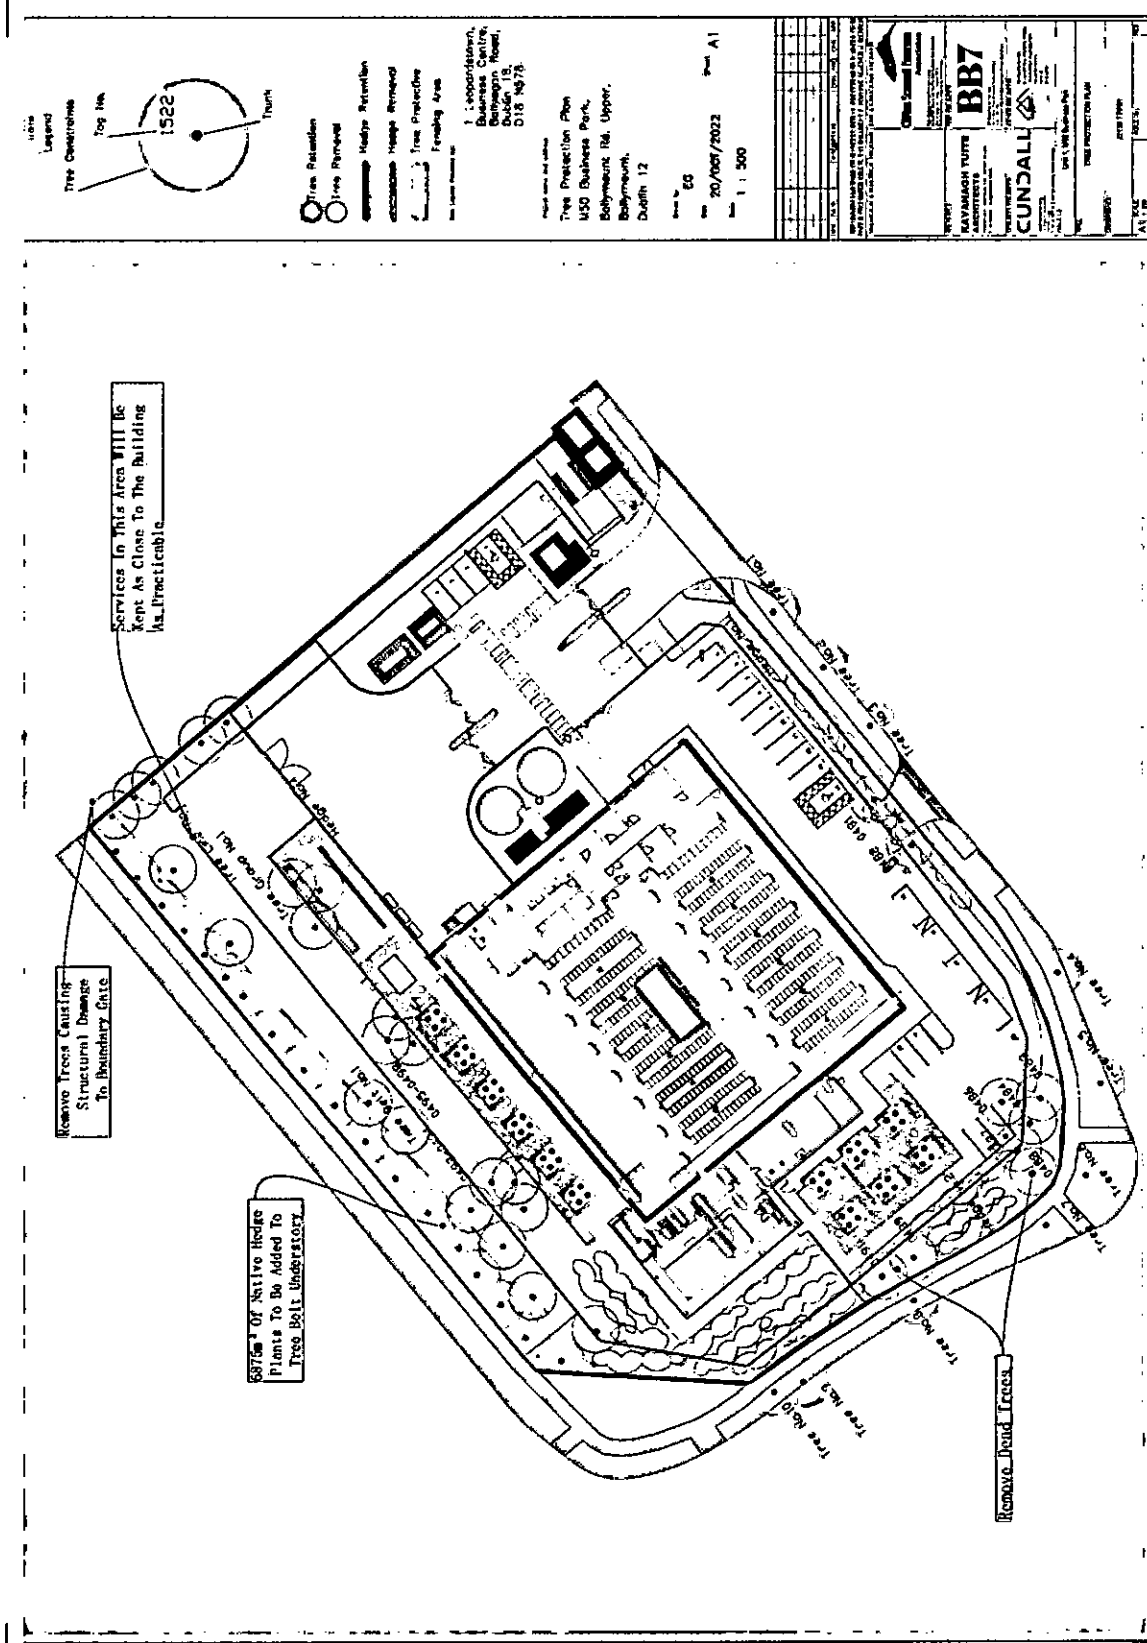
Showing the Proposed Development landscape plans with removal of trees indicated.
